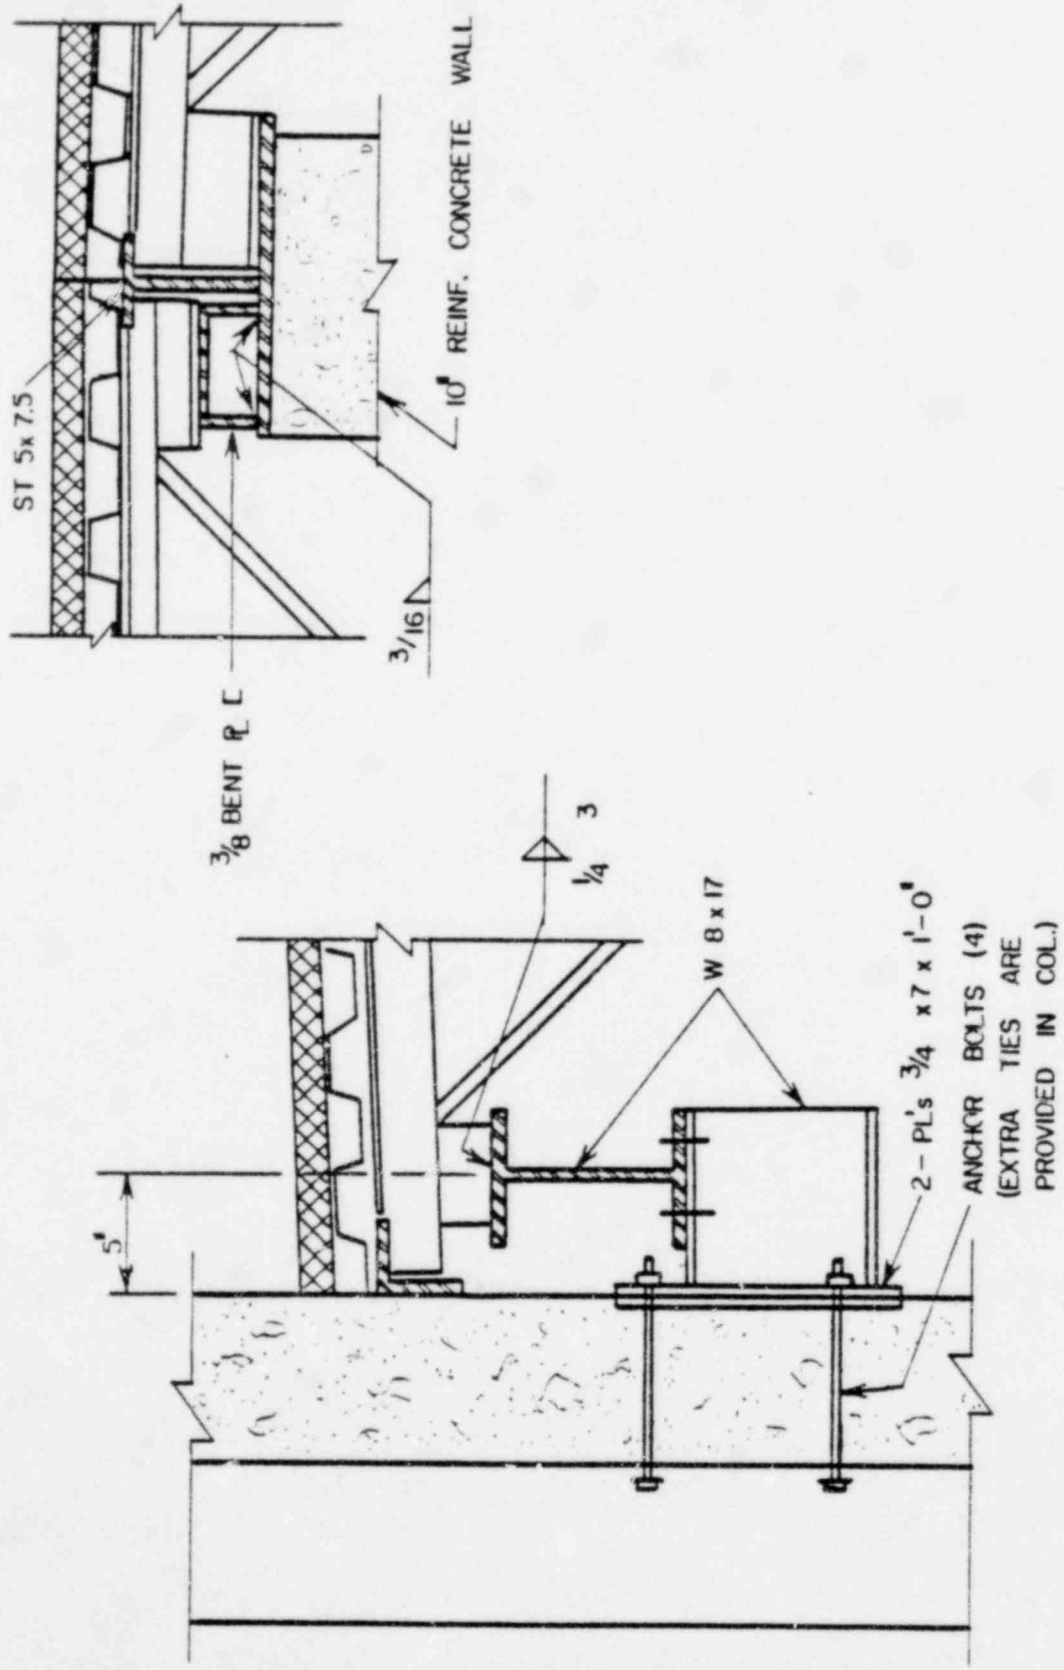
SECTION SHOWING JOIST BEARING DETAILS
